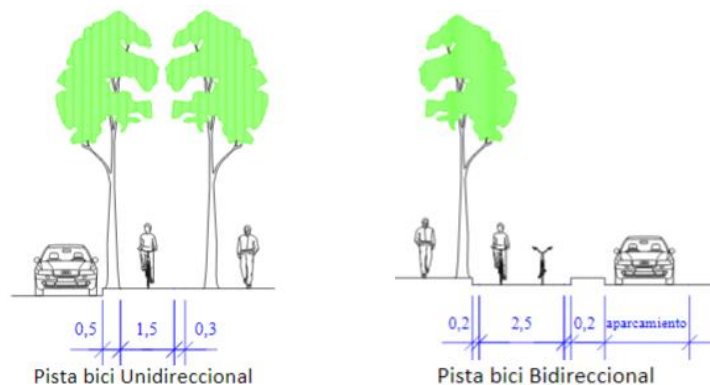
Cycle-road section (Source: revision PGOU 2017).
